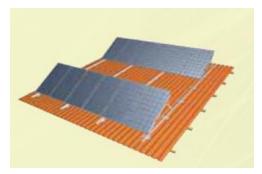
Roof Hooks and Profile Carriers (Antaris Solar Germany, 2012)
